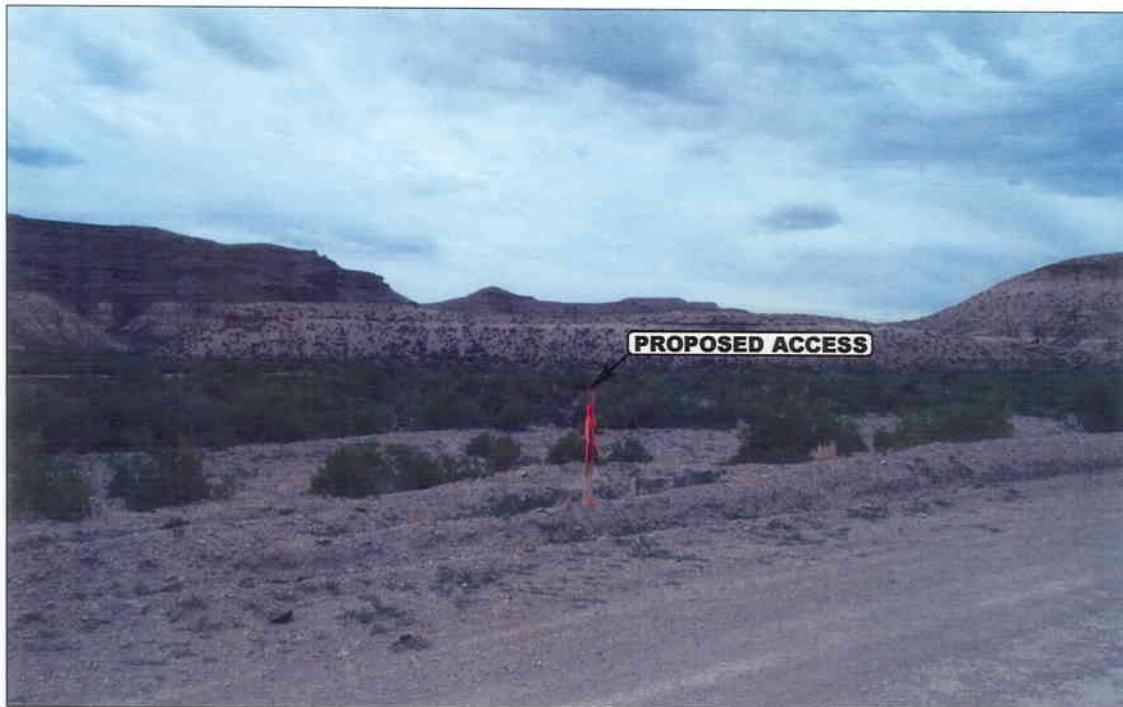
PHOTO: VIEW FROM BEGINNING OF PROPOSED ACCESS
